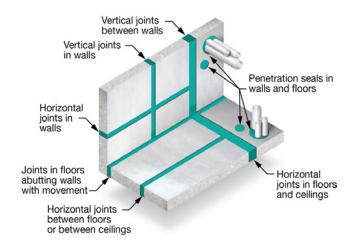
Overview of possible uses of fire rated silicones in walls and floors
